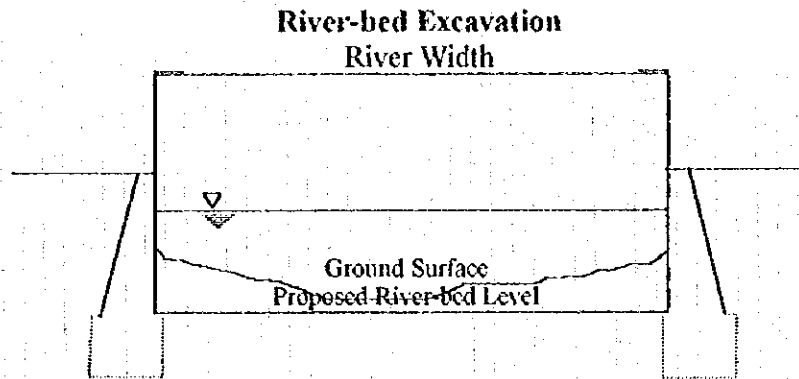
Typical Cross Section of Riverbed Excavation
